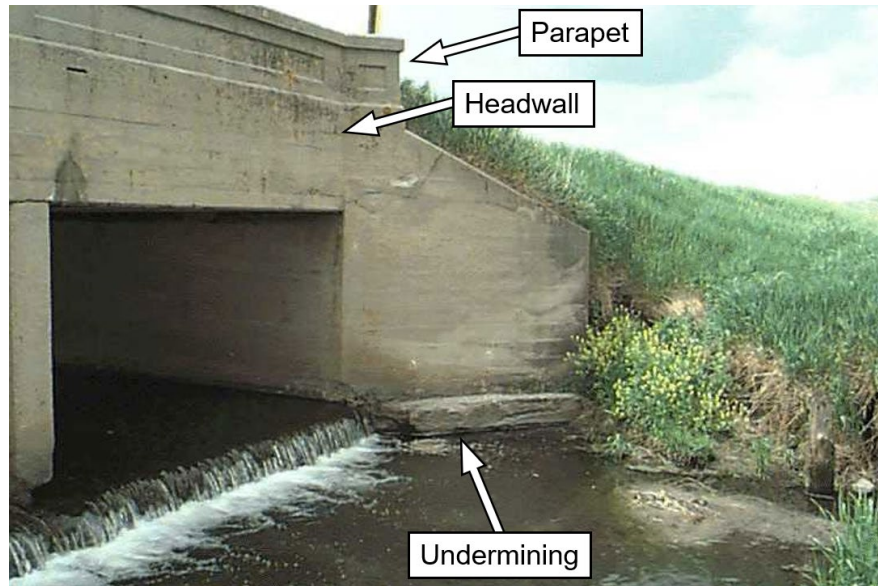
Cast-in-Place Concrete Headwall with Undermined Wingwall
